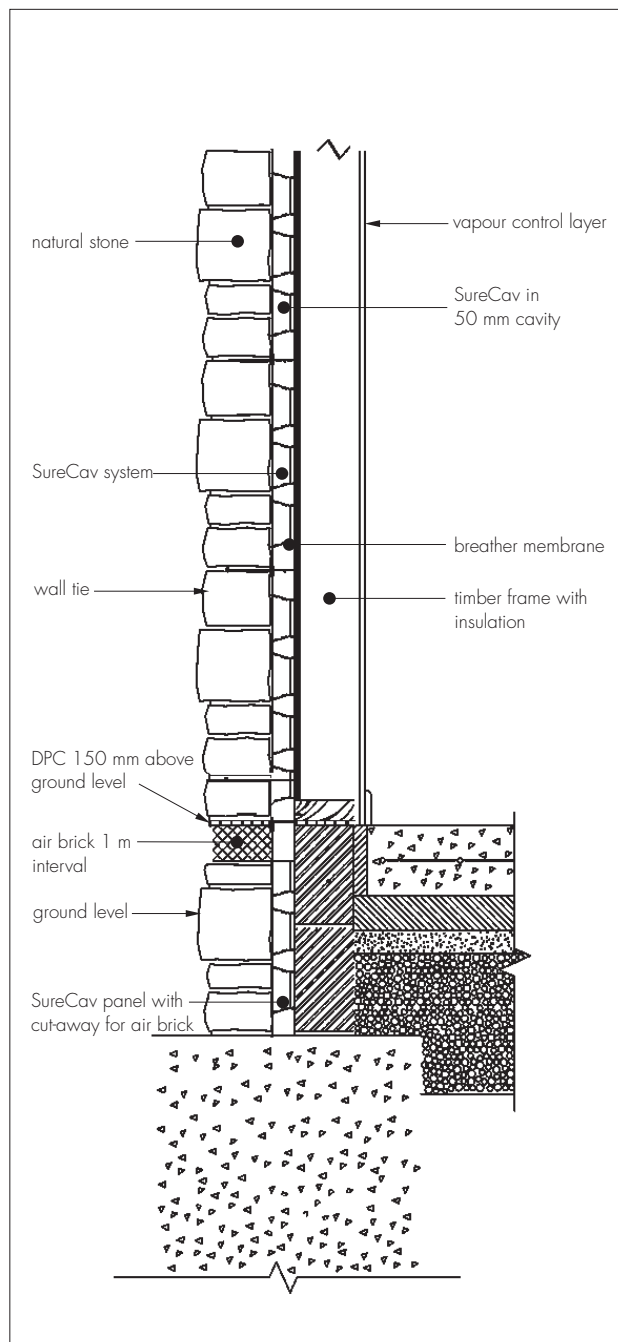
Typical detail of timber frame with brick or stone outer leaf wall
